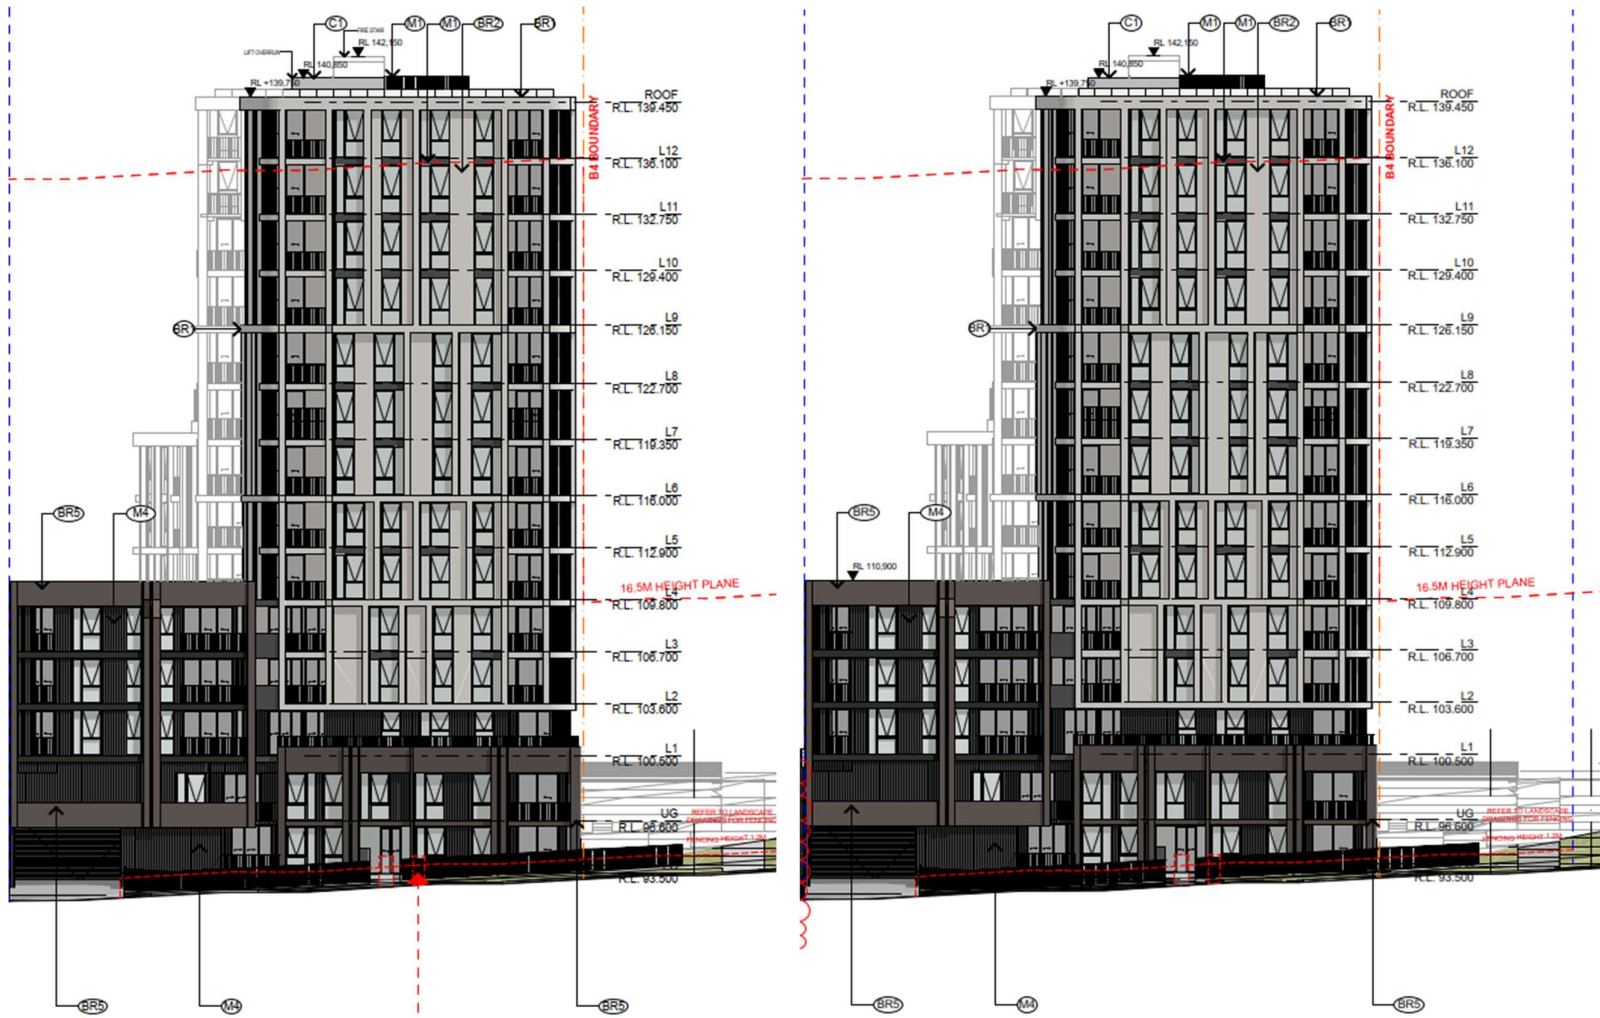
Approved and Proposed Building-D North Elevation James Street (4 of 4)
